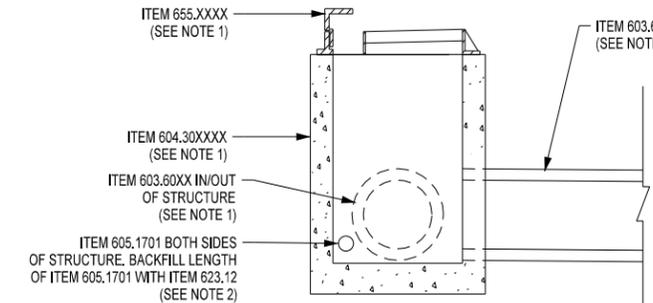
DETAIL G - BACKFILL OF STRUCTURE WITH ITEM 623.12 WITH UNDERDRAIN STUBS
